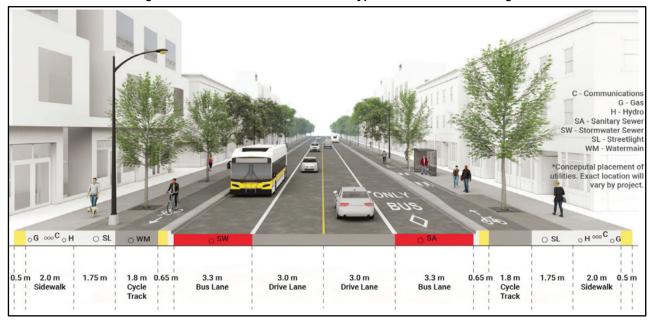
20 m ROW Urban Avenue Typical Cross-Section Design
